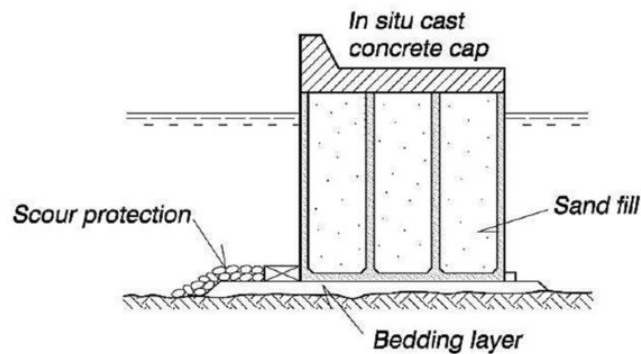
Cross-section of a typical concrete caisson breakwater [34].
